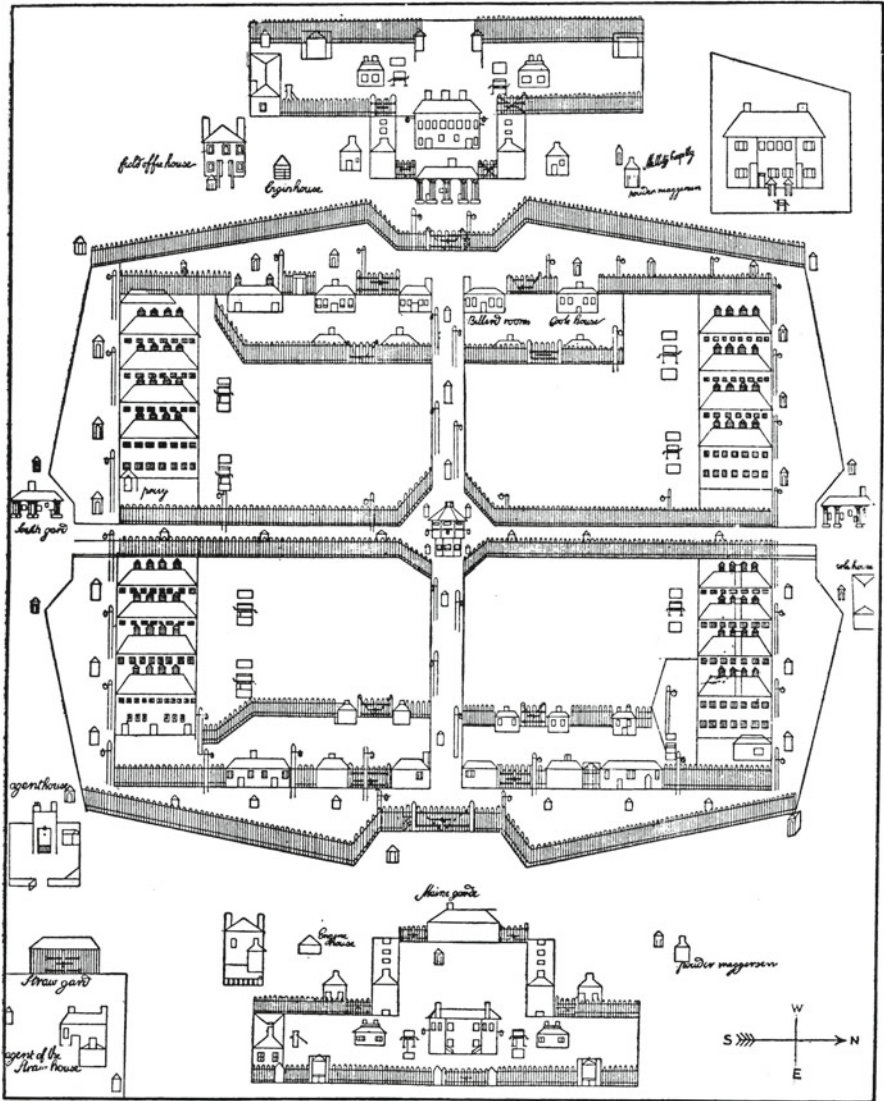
Plan of Norman Cross 1797–1803 by Washingley; note schematic North to the right (after Walker 1913)
